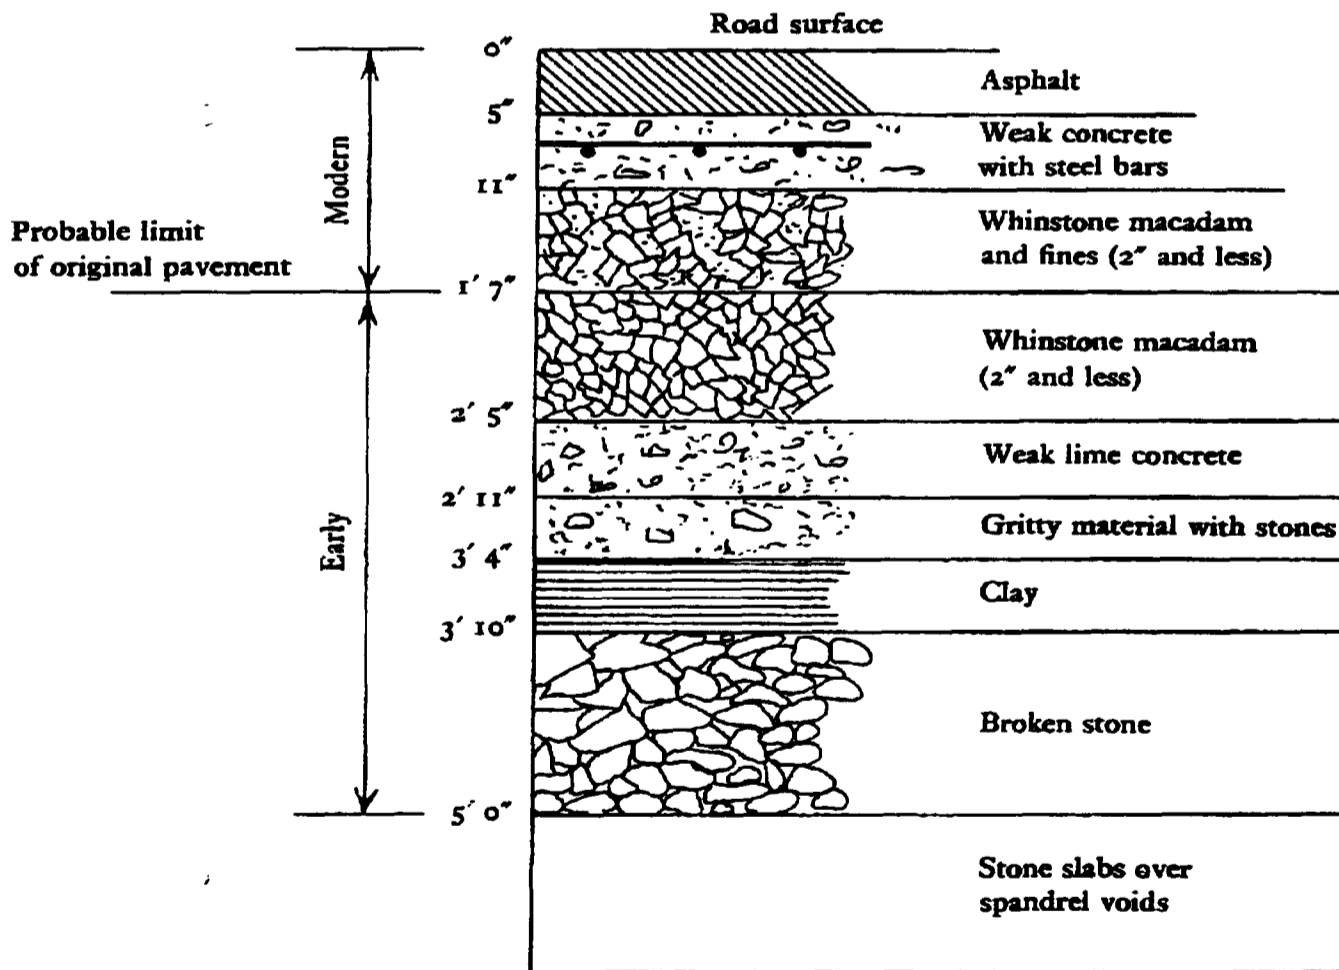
Cross-section of roadway of Dean Bridge (after Ruddock, 1979).
